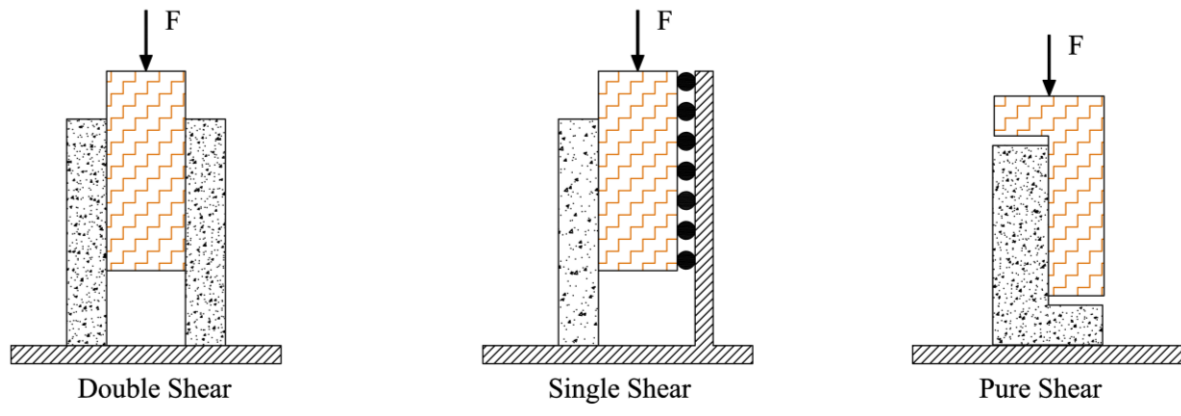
Major principal types of the testing set-up of shear tests for TCC
